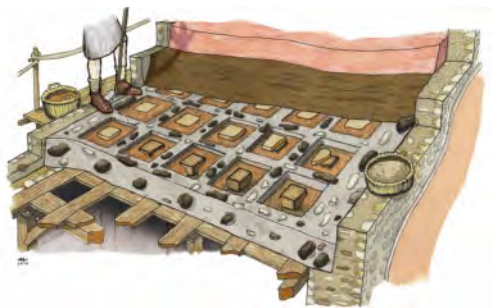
Reconstruction of the floor's construction system (area 45): covering by successive layers (Antoine Louis).
